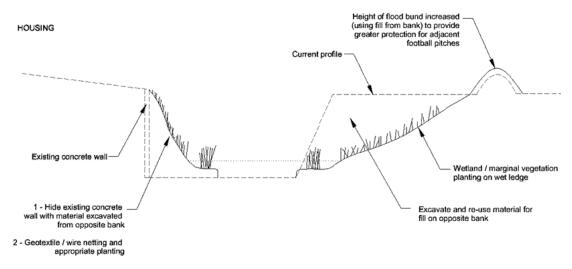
Schematic of concrete bank wall hidden with excavated material. Connswater, East Belfast.
